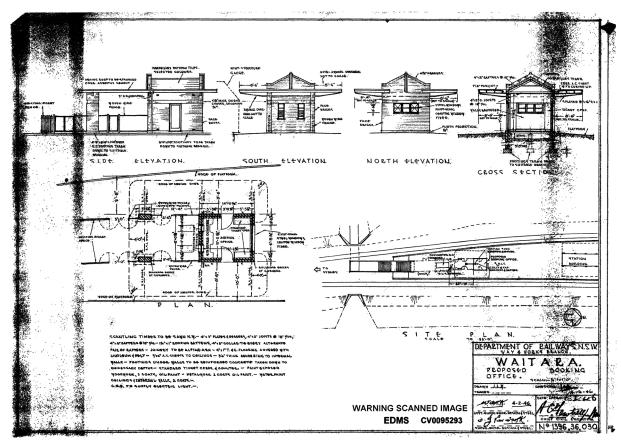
Plan of the upgraded Booking Office building, dated 1946. (Source: Sydney Trains Virtual Plan Room)
